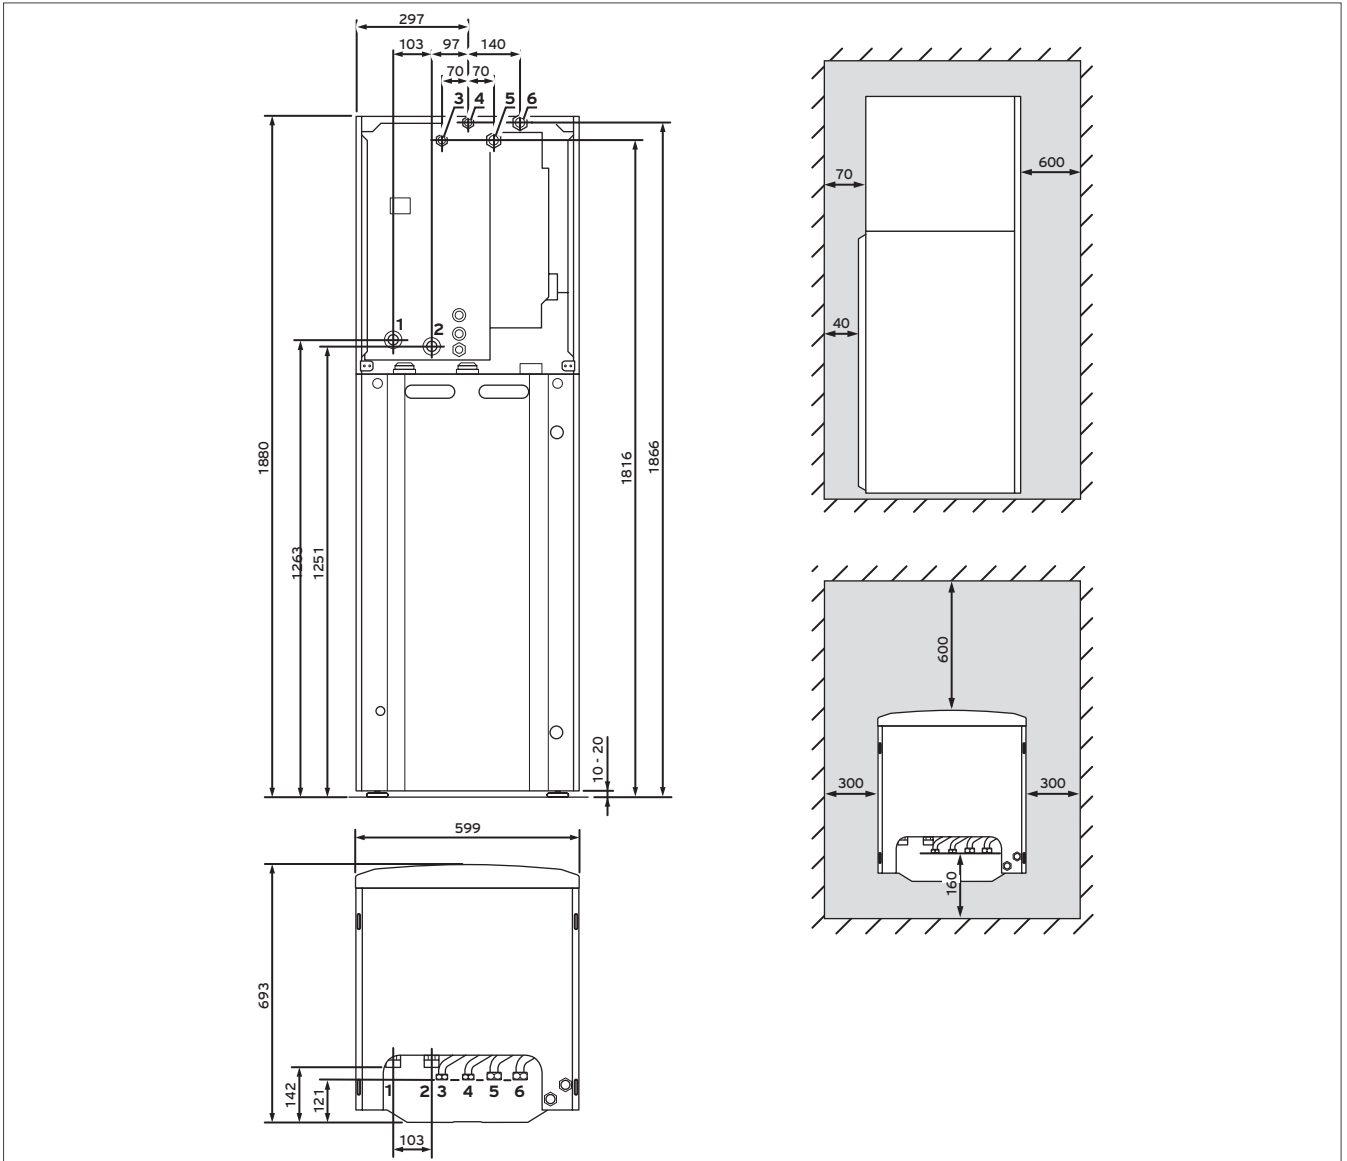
uniTOWER VIH QW 190/1 E dimension drawing and connection dimensions
